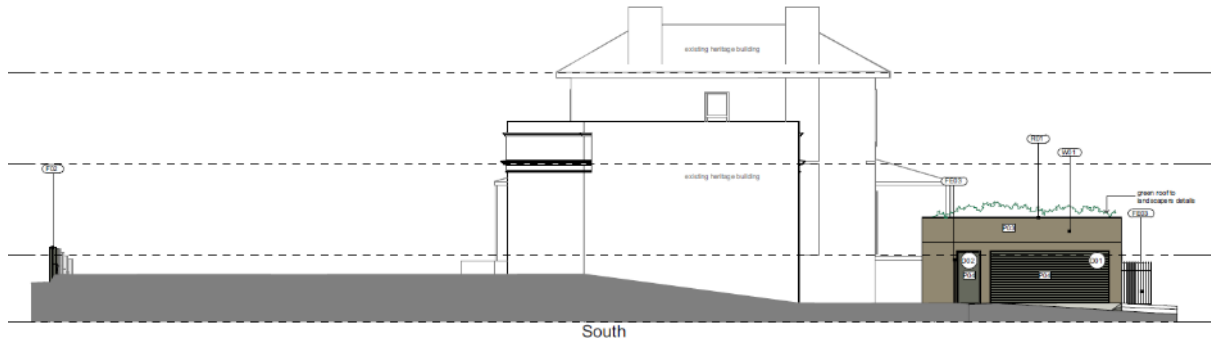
Proposed south elevation (Ferry Lane) - Bidura House
